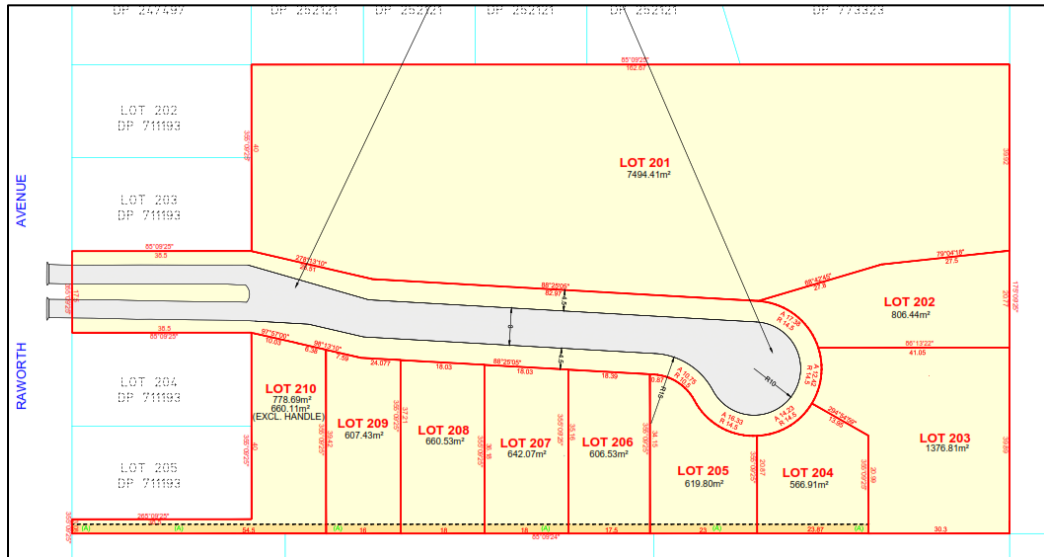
Extract of proposed plan of subdivision (Le Mottee Group)
